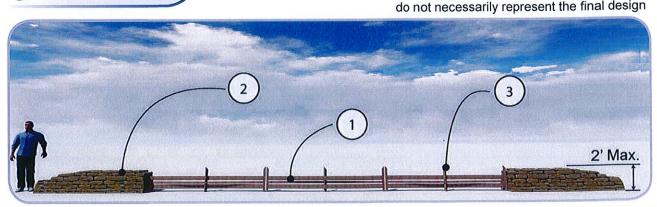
Example of Split Rail and Stone Veneer Accent Element
